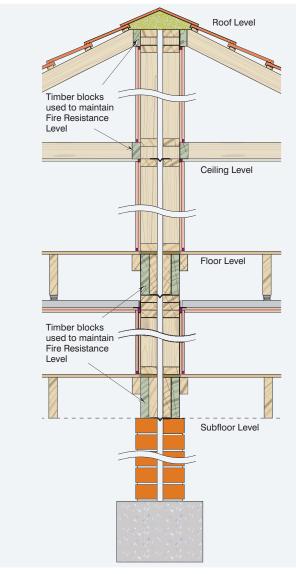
Common locations of sacrificial-timber blocking – elevation view.
